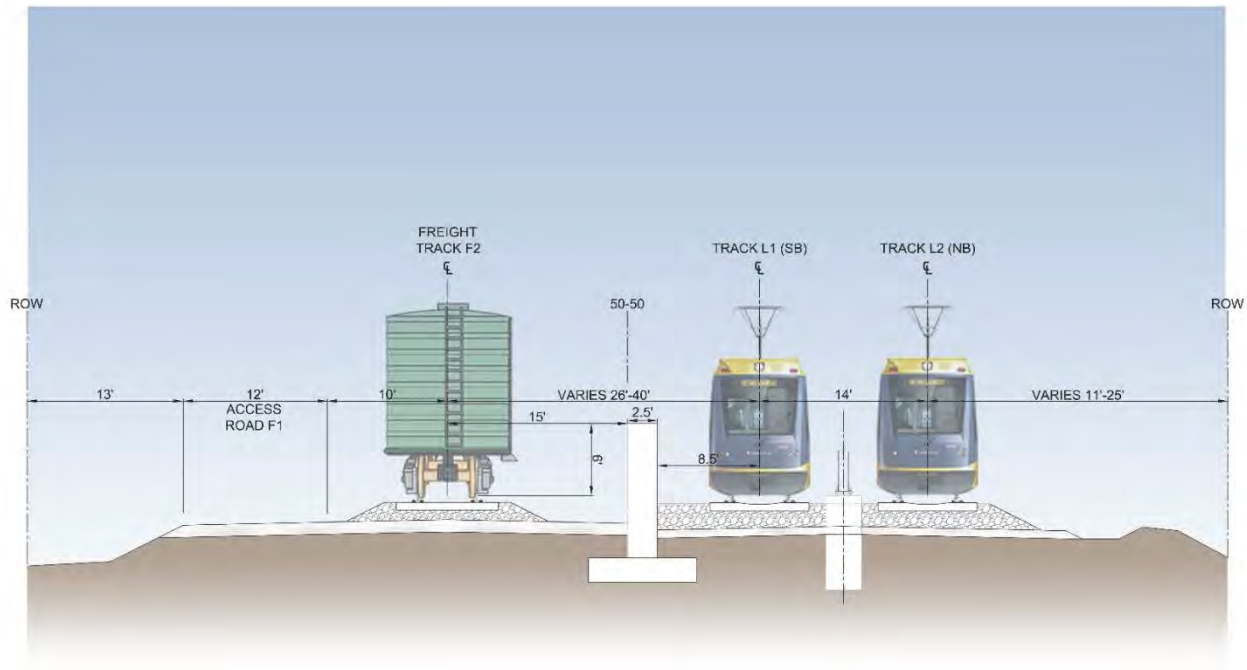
Typical Railway Section – Wall Corridor Protection
